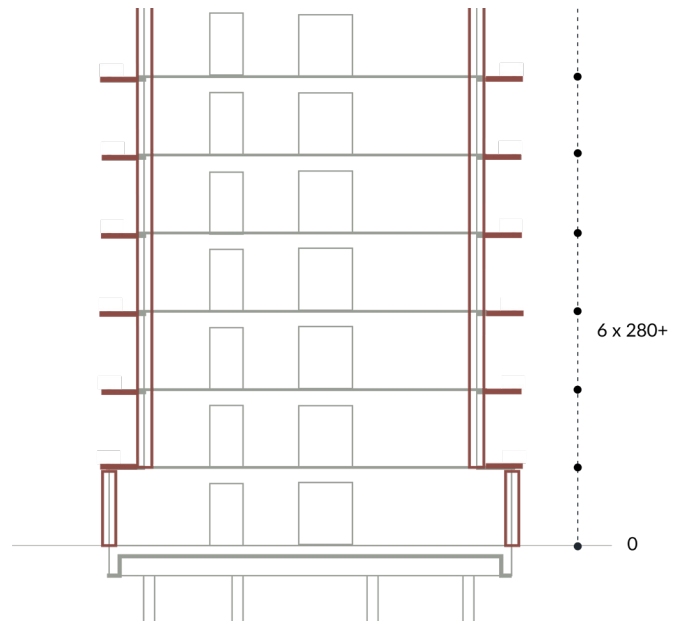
| Schematic Design of Facade Panel and New Balcony Construction
